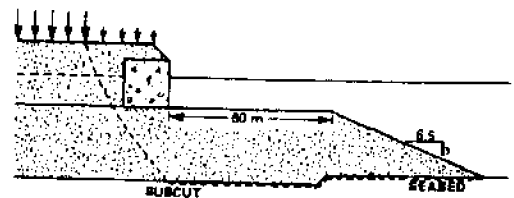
POTENTIAL FAILURE MODE UNDER GRAVITY LOAD AT A CAISSON ISLAND
